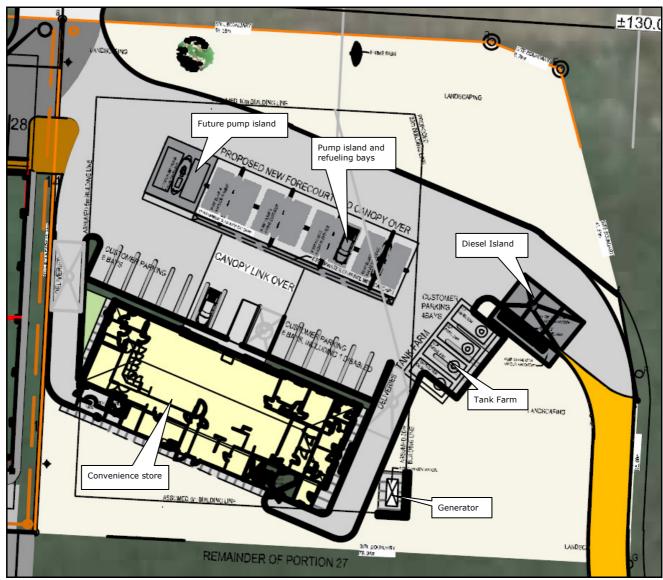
Conceptual layout plan (taken from Kotze, 2017)
